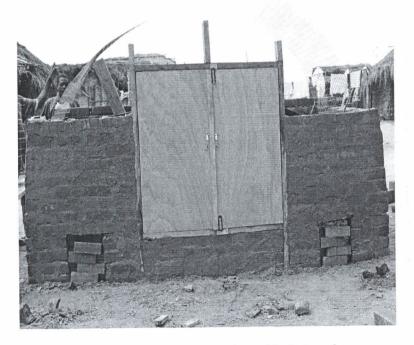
Fixing of doors with handle and locks into frame. (Inner part of door is lined with aluminium sheet)
